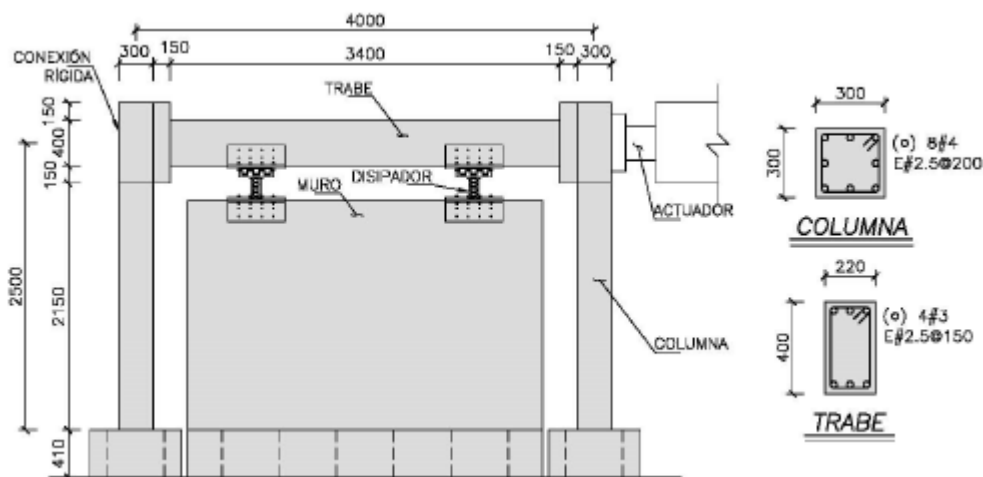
Dimensions (mm) of the reinforced concrete frame. (Instituto de Ingenieria UNAM, 2017)
